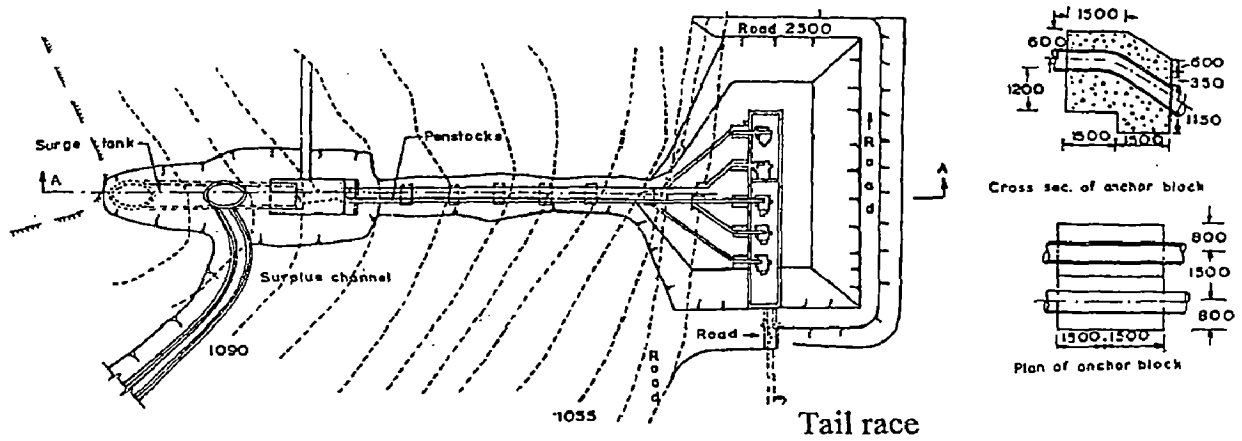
TYPICAL LAYOUT OF INCLINED SURGE TANK AND PENSTOCK ANCHORAGE BLOCK DETAILS
